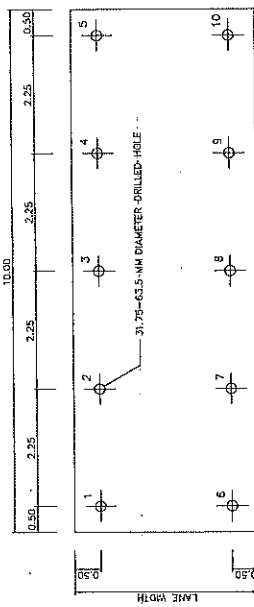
PLAN OF DRILLING FOR CEMENT MORTAR COMPRESSION ALONG THE PUMPING JOINT
